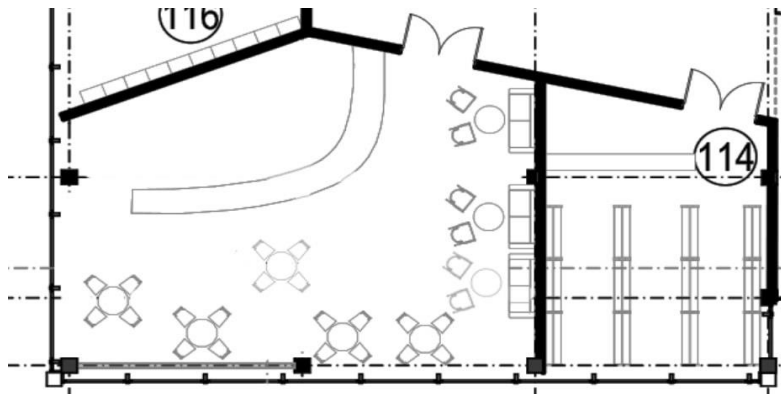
Floor plan of the café in Building 7 [made by the authors]
